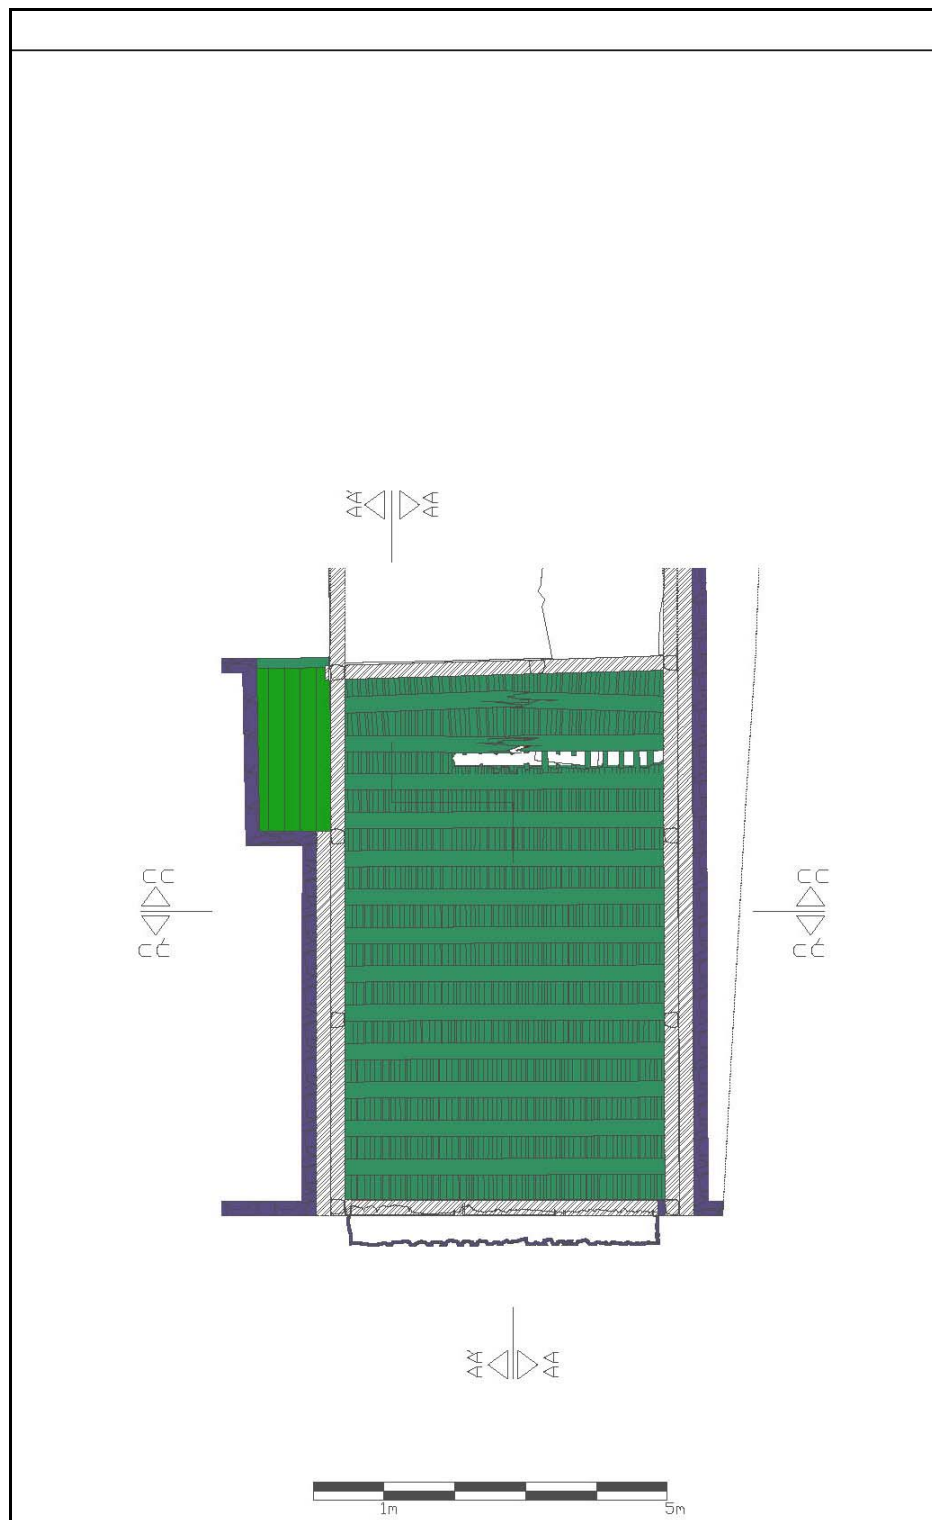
Analysis of S. S. & C. T.; Basement Floor Reflected Ceiling Plan: 1/100 (Pr. in 1/50 at Jury)
